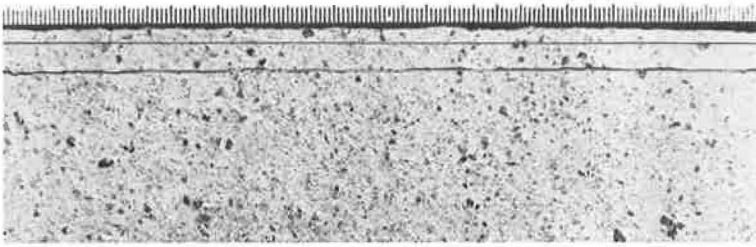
Uniform wear on concrete pavements (Highway 401, Toronto Bypass).
